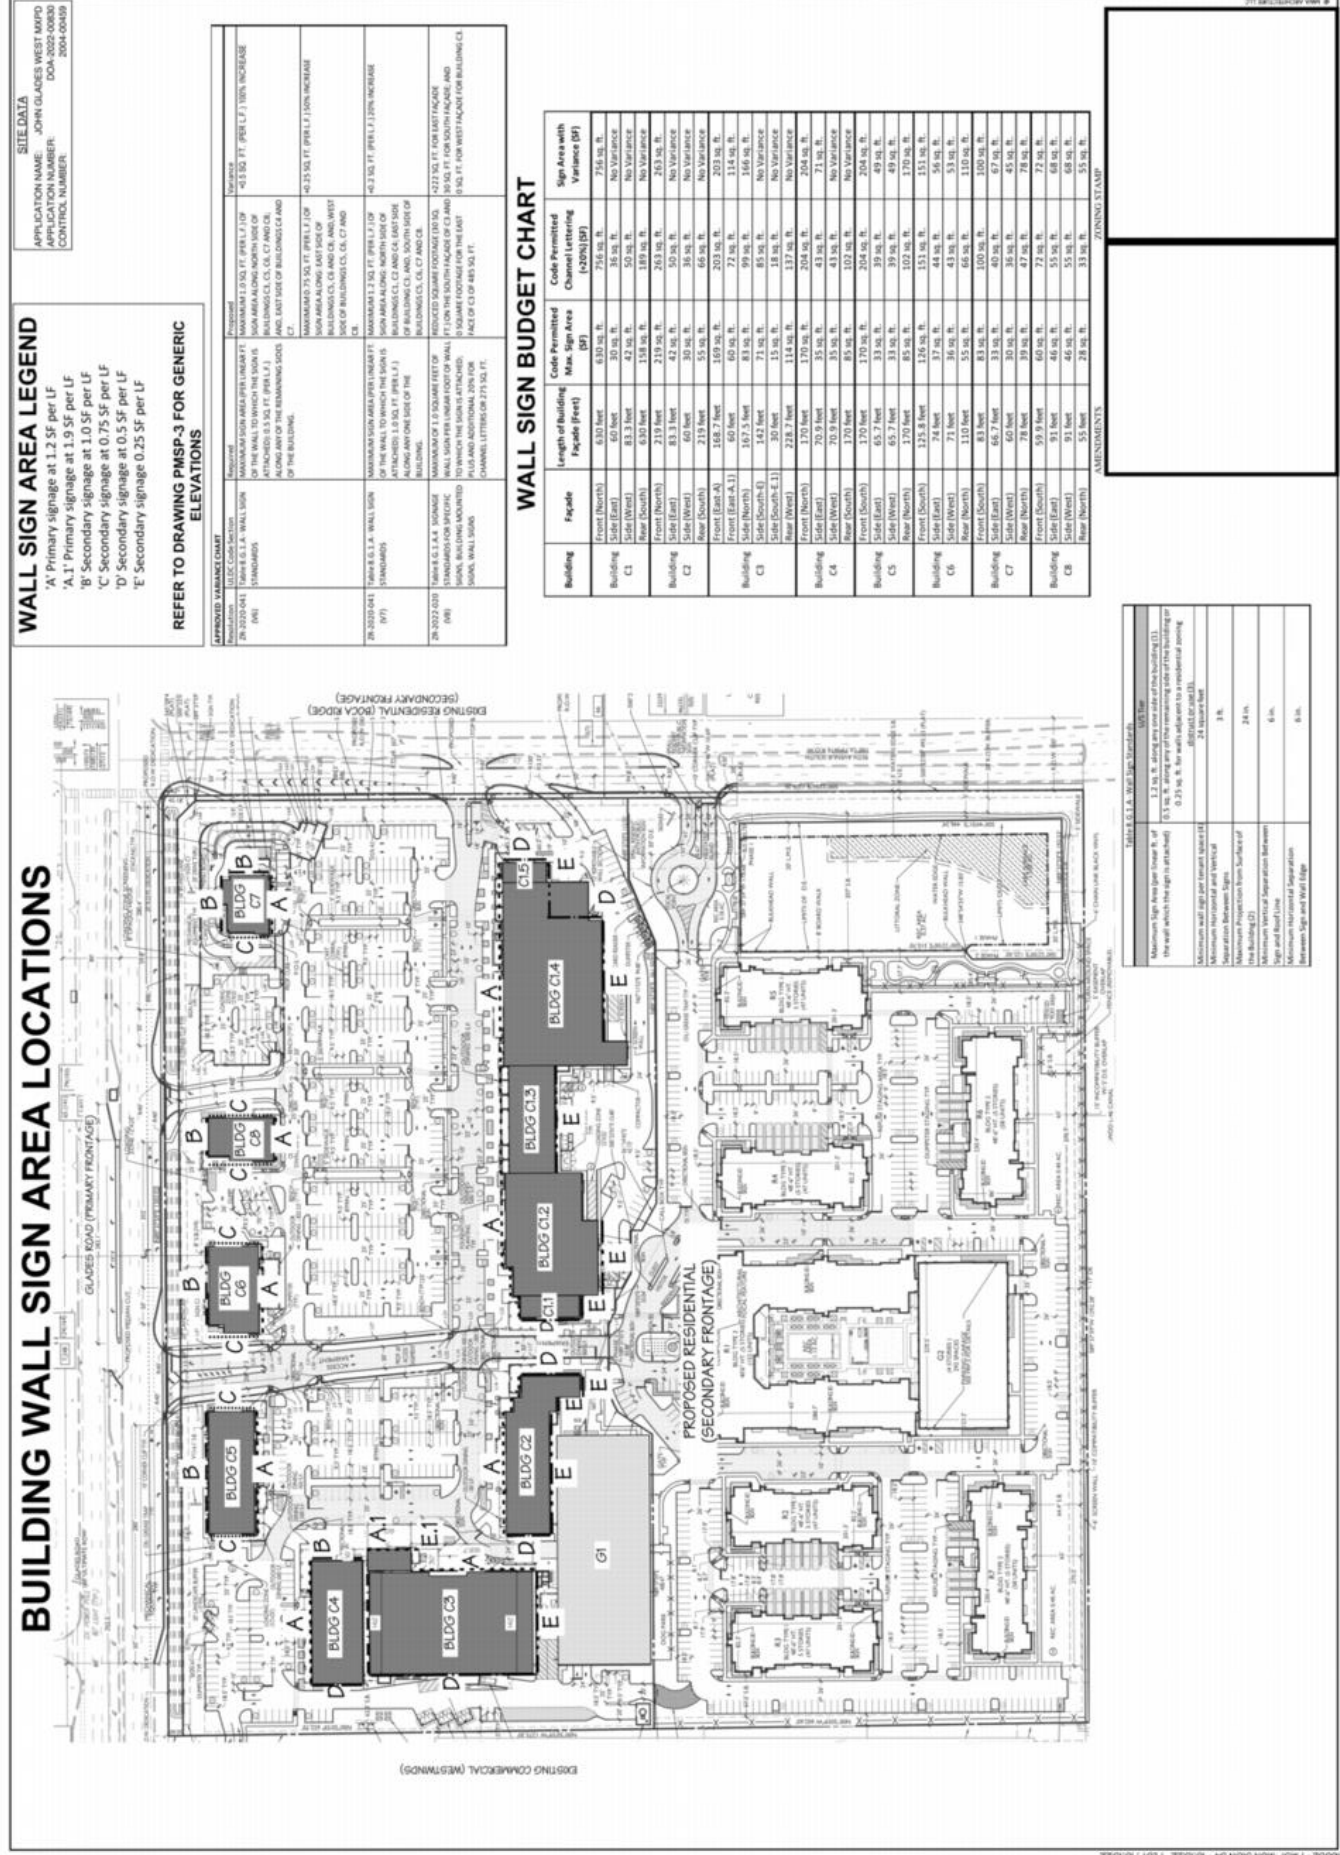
Preliminary Master Sign Plan (PMSP-2 of 3) dated October 13, 2022
